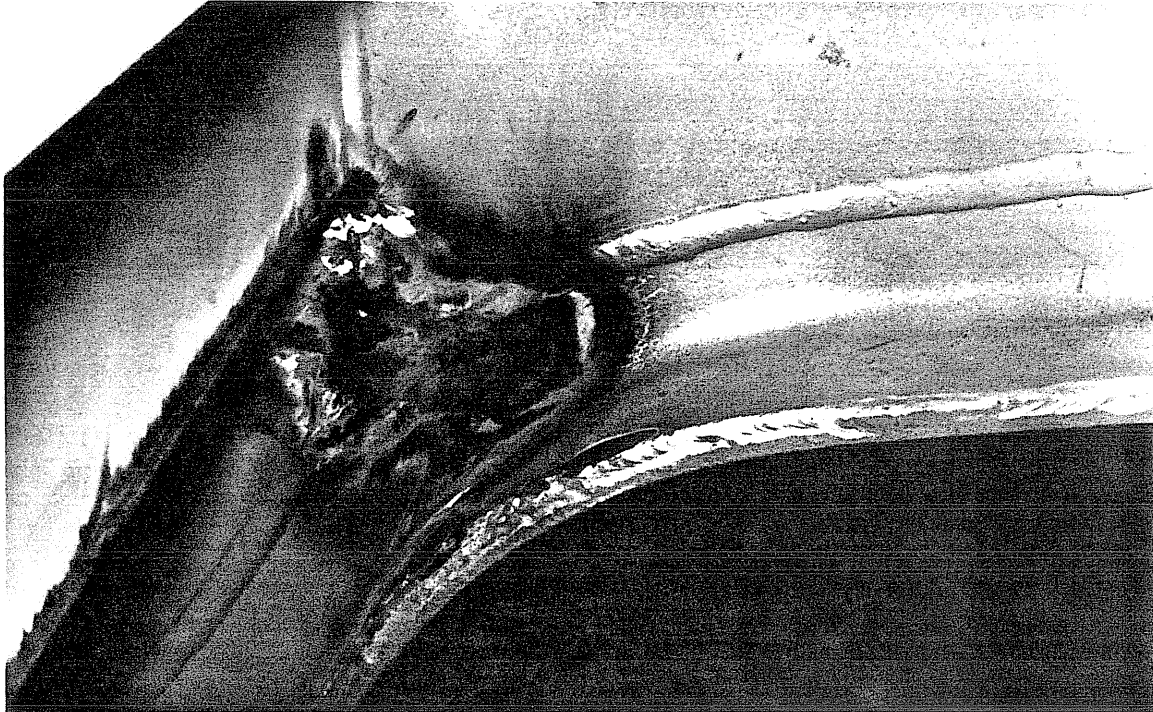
Repair Weld on Inside Surface of Beam Web
